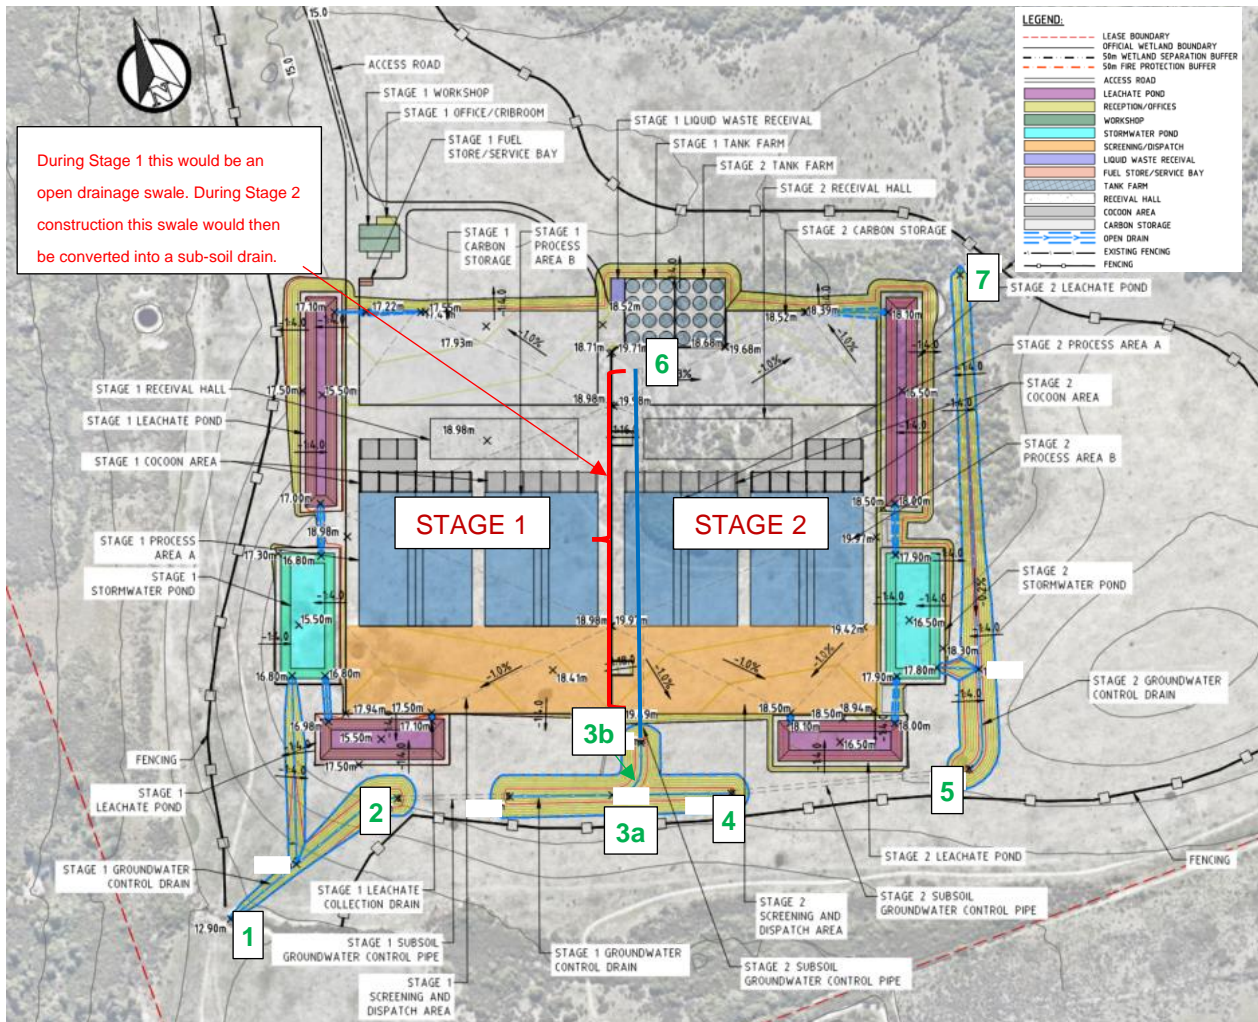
Proposed Groundwater Control Drainage Layout Plan.
